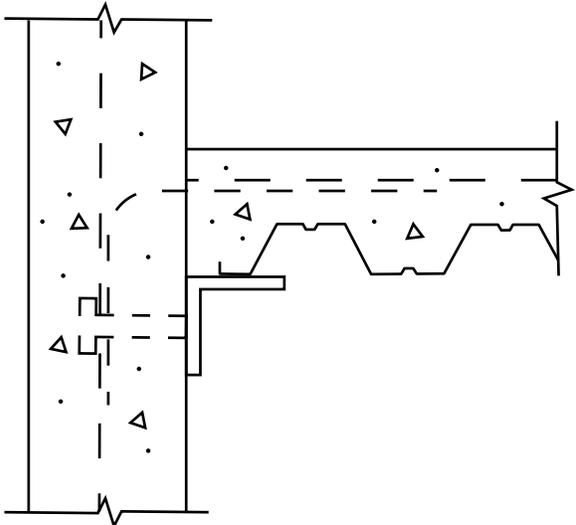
CONCRETE OR CMU WALL LEGER DECK PARALLEL
